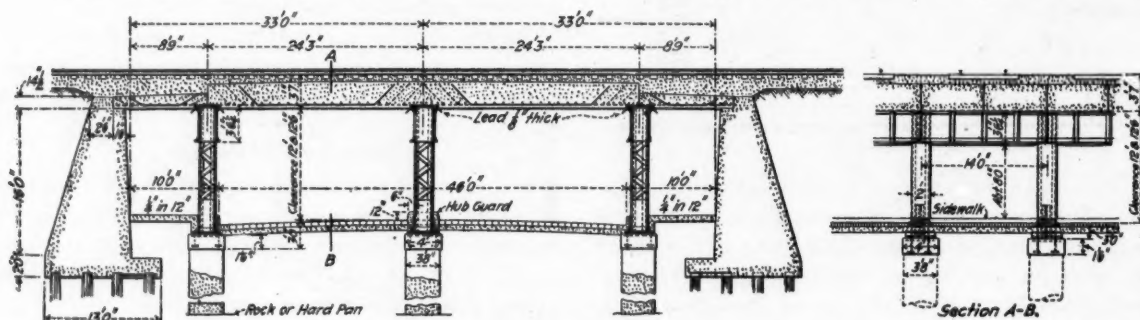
DETAIL OF SUBWAYS CONSTRUCTED WITH STEEL COLUMNS AND CROSS GIRDER, AS WELL AS REINFORCED CONCRETE GIRDER SLABS, ROADWAY CONCRETE CONSTRUCTION, C., B. & Q. RY.
